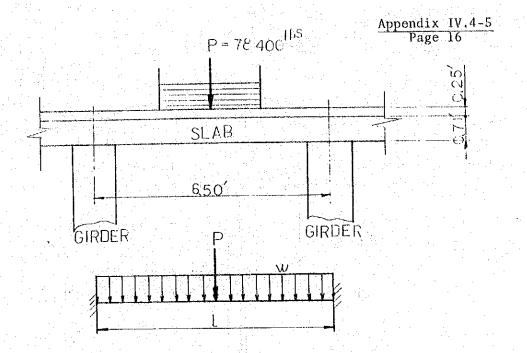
LOAD FOR MIDDLE SLAB
